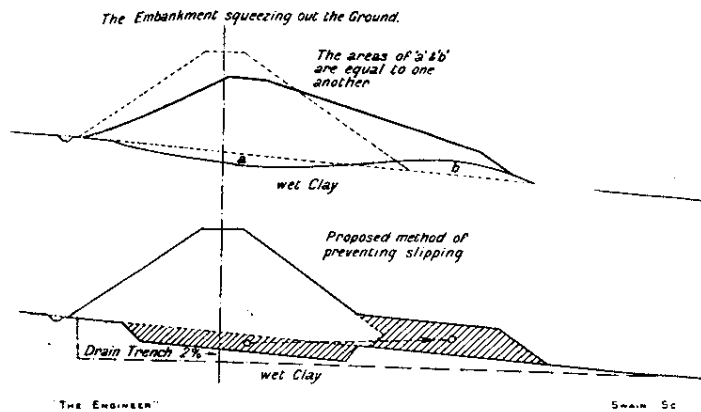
CROSS SECTION OF EMBANKMENTS ON SOFT GROUND
